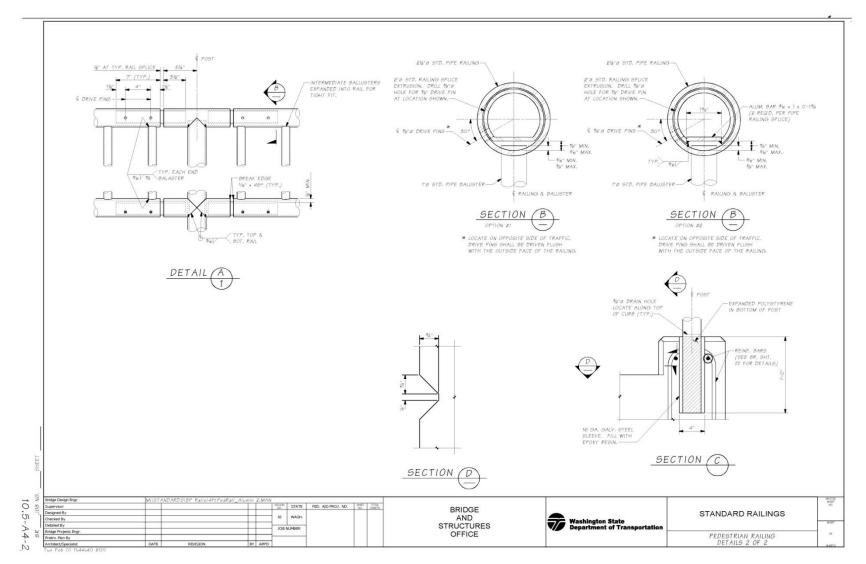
Washington DOT Standard Railing (Sheet 2 of 2) [29]
